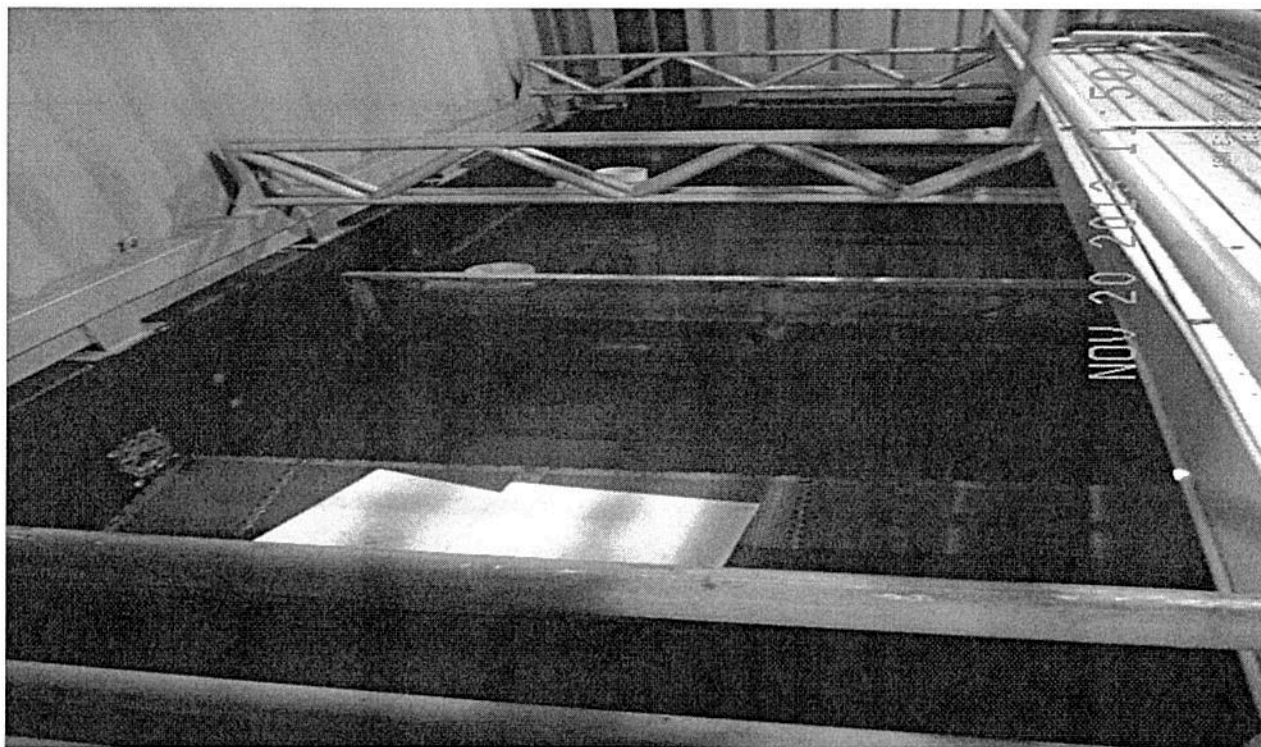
Oil-water separator at Outfall 201, installed in 2011.
